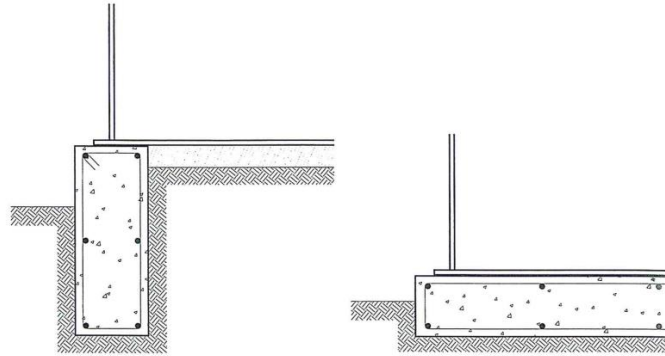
Foundation types for cylindrical steel tank: (a) ring foundation, (b) circular base plate
